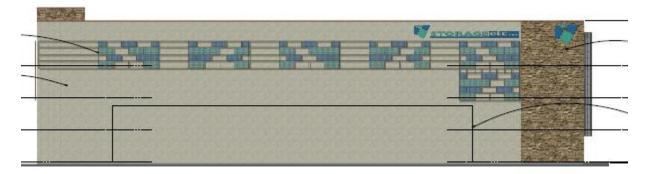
View of the eastern elevation. Decorative metal panels have been added to add design variation to the facade. Outline of existing eastern adjoining property also visible.
